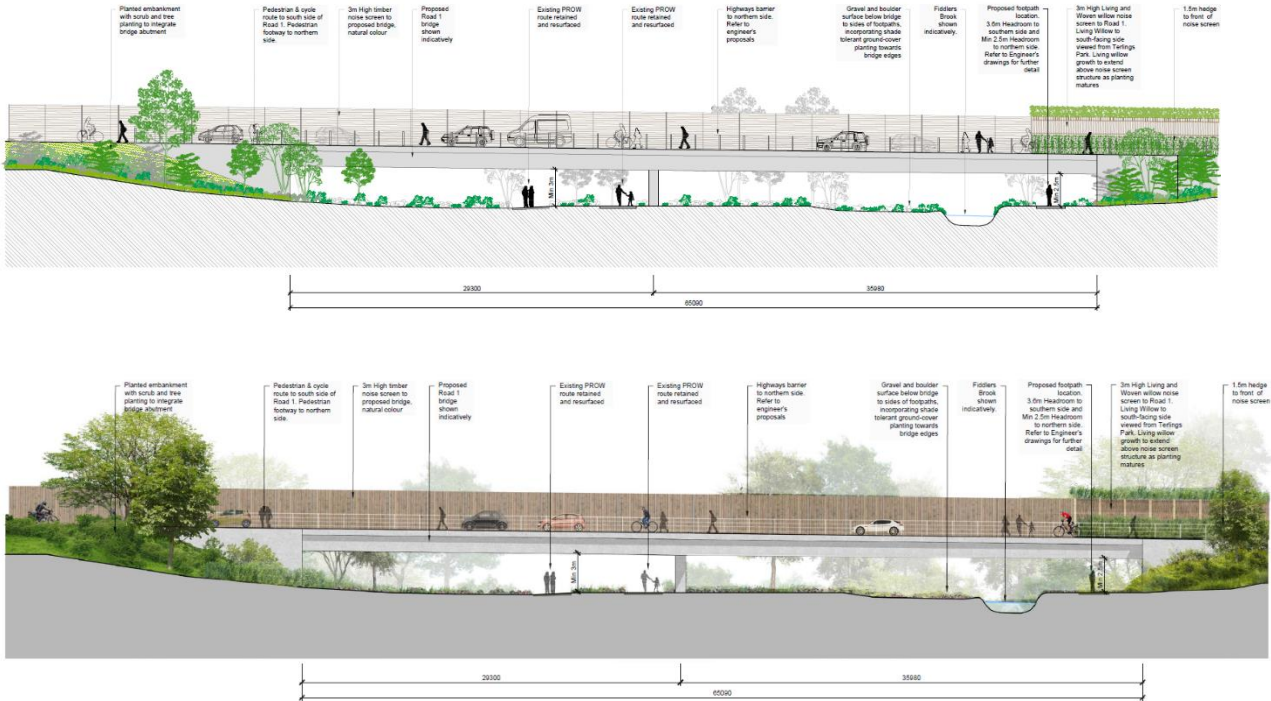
Eastern Stort Crossing Vision (looking West, with Terlings Park at the centre top)
